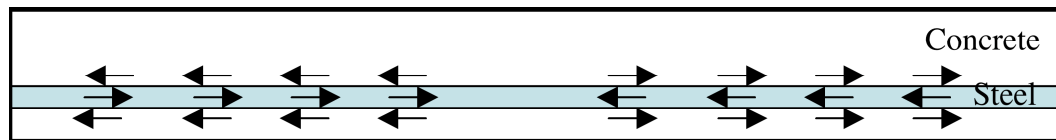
Concrete Restrains the Steel Retraction in Pretensioning
